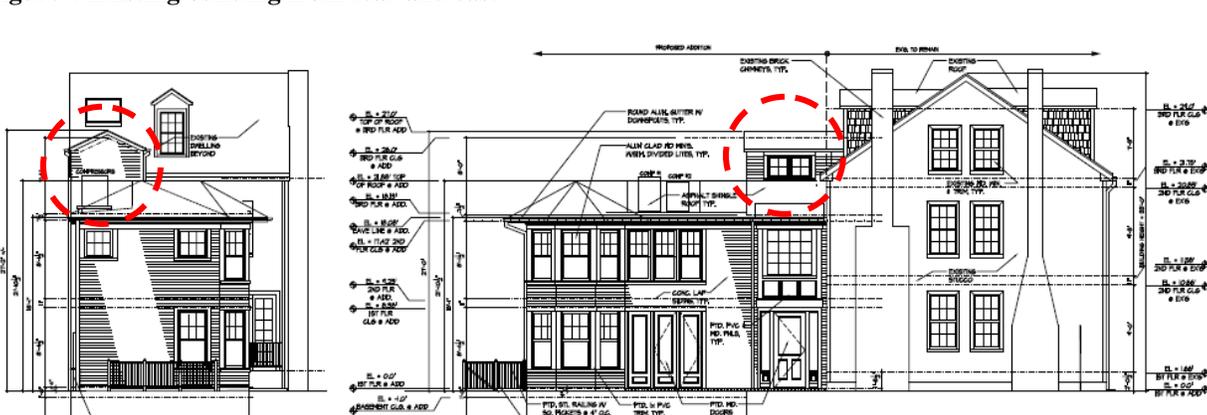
Proposed Building from Rear and East. Note partial 3rd story at junction of main building and addition.
